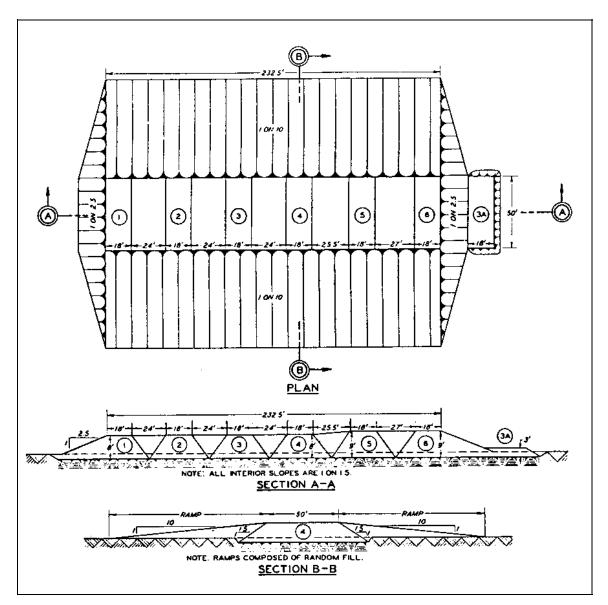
Gilham Dam, plan and profiles of the test fill
